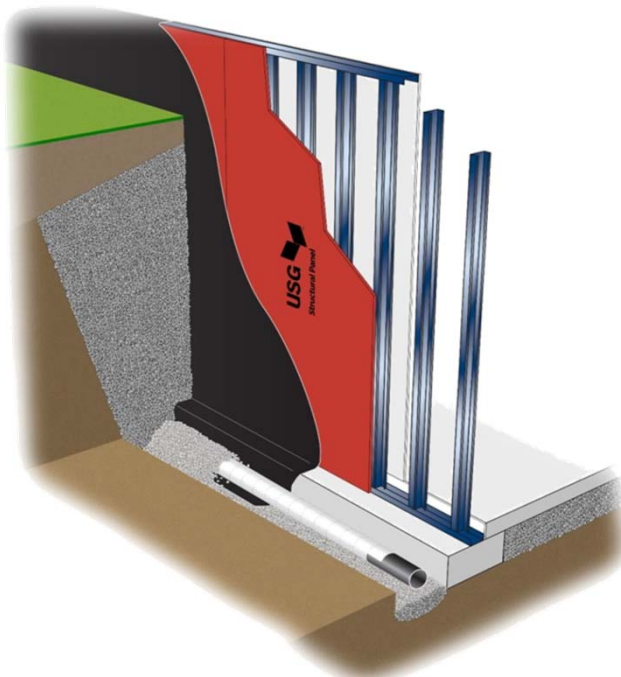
USG Structural Panel Concrete Foundation Wall Typical Installation
